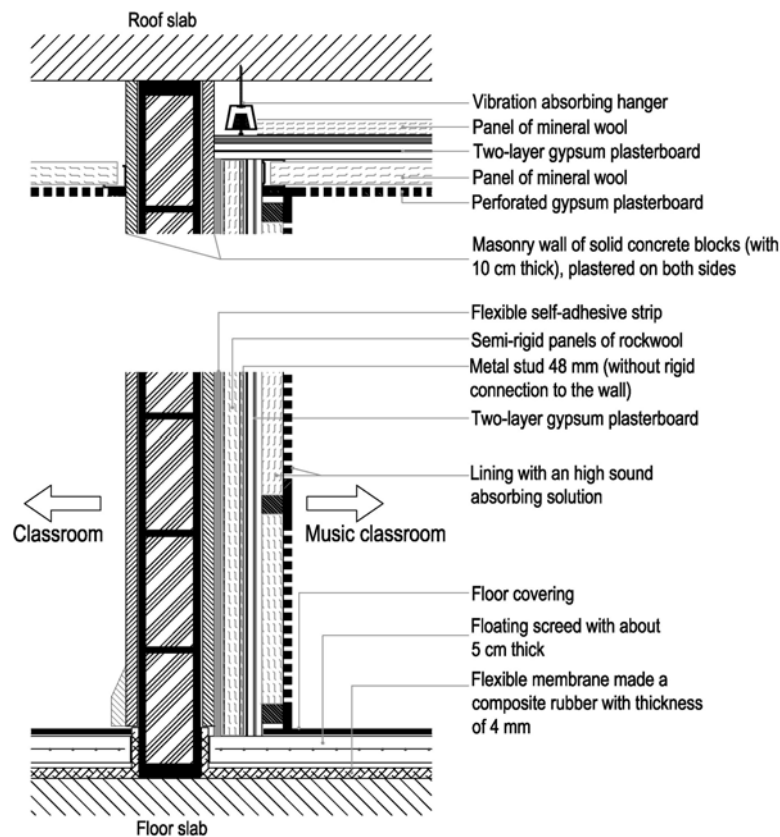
Example of a constructive solution proposed for the elements that separate a classroom from an adjoining music classroom
